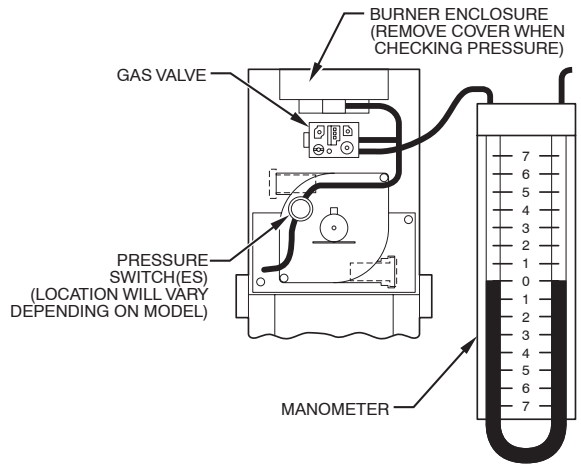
Adjusting Manifold Pressure (Manometer Attachment)
